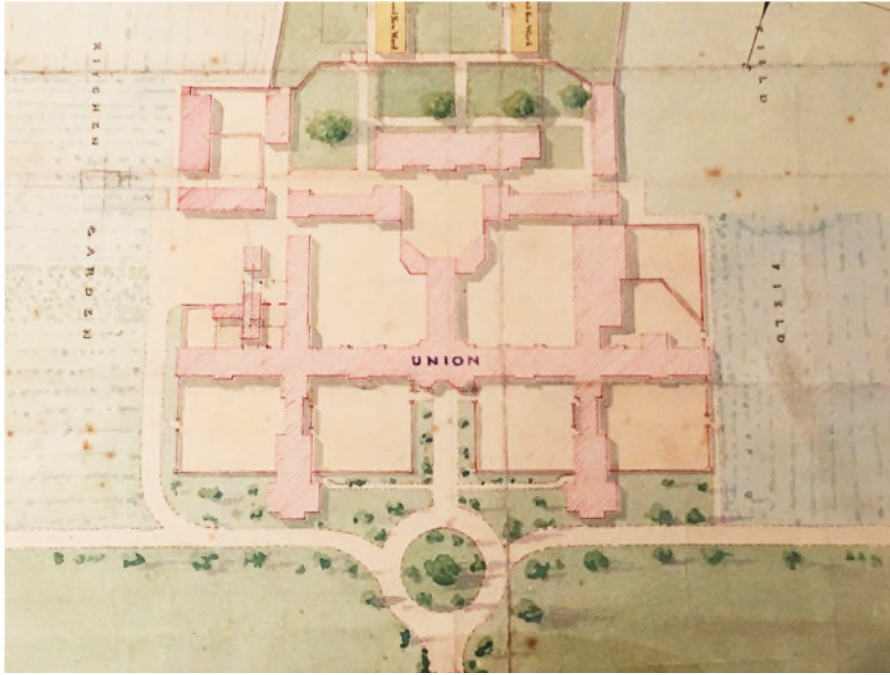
Block plan of the Windsor Union Workhouse in c. 1866
